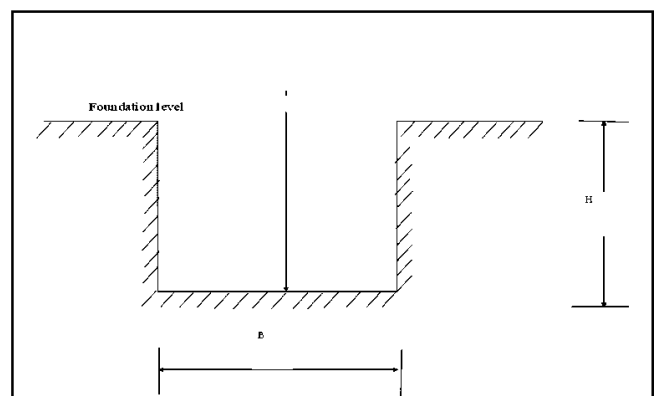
Typical foundation excavation for soil sampling (B – foundation width, H - foundation height. Drawing, not to scale)
